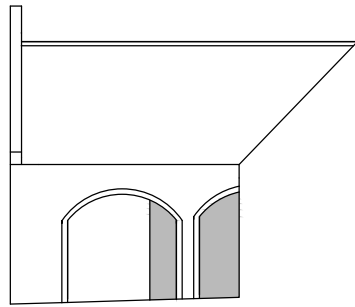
Buildings 1 & 4, south west facing elevation and south east facing elevation showing blocked in opening
